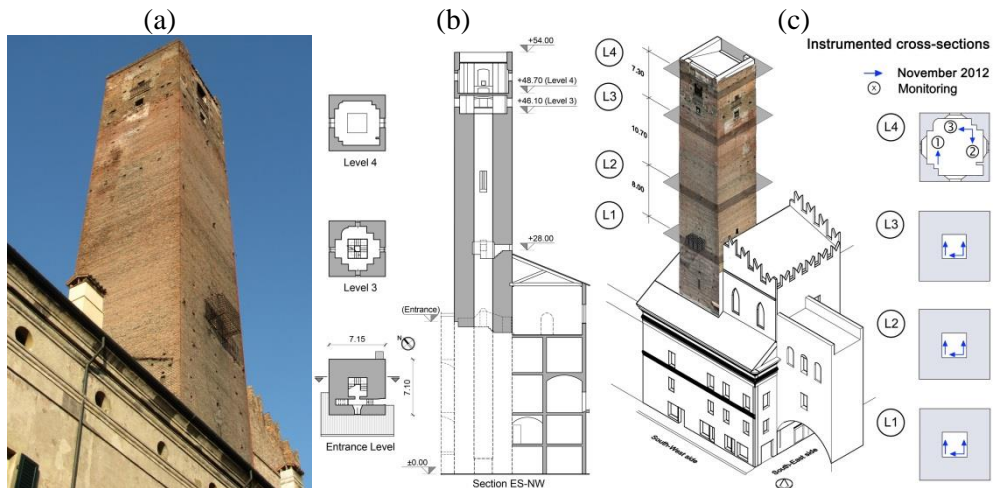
(a) View of the *Gabbia Tower* in Mantua, Italy; (b) Sections of the tower (dimensions in m); (c) Instrumented cross-sections and layout of the accelerometers during the preliminary tests (November 2012) and the continuous dynamic monitoring.
